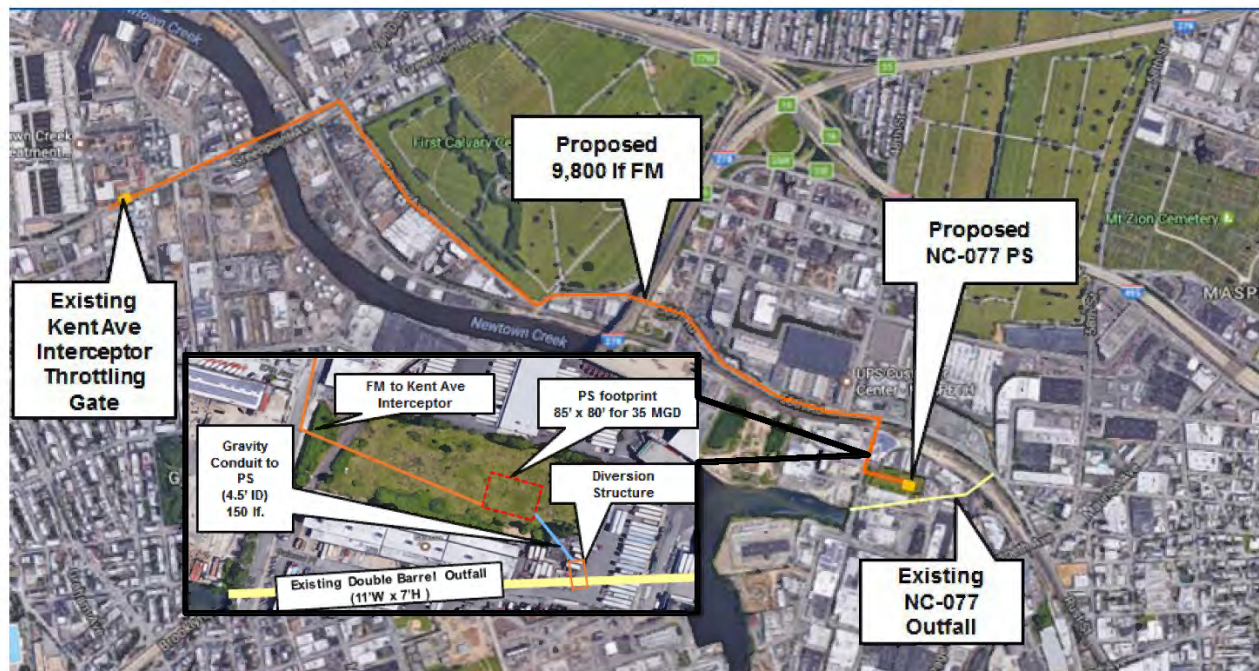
Layout of New Pumping Station at Outfall NC-077 part of Alternative CR-1
